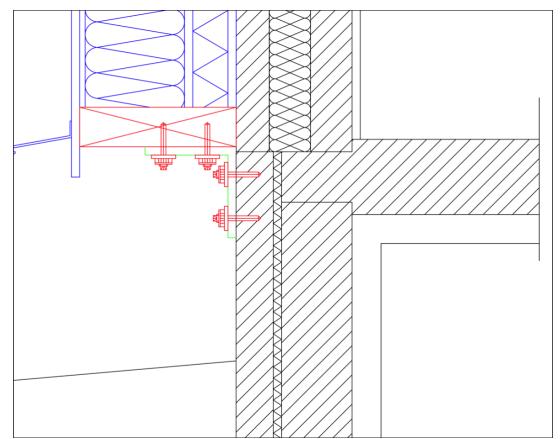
L-bracketing at lower part of the prefabricated facade that is fixed onto the existing building facade and carrying the TES prefabricated facade element.
